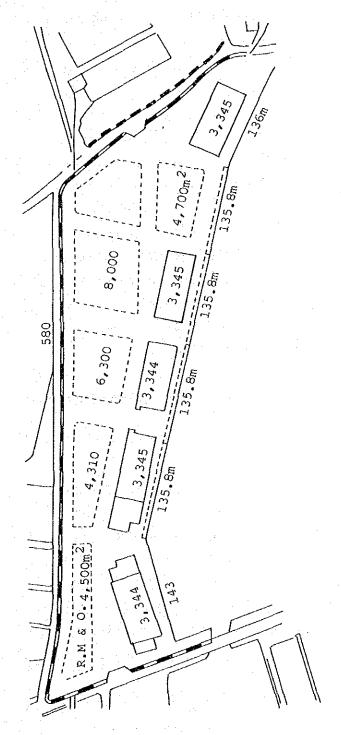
Improvement Plan of East Side of KPD1 in 2004/05
